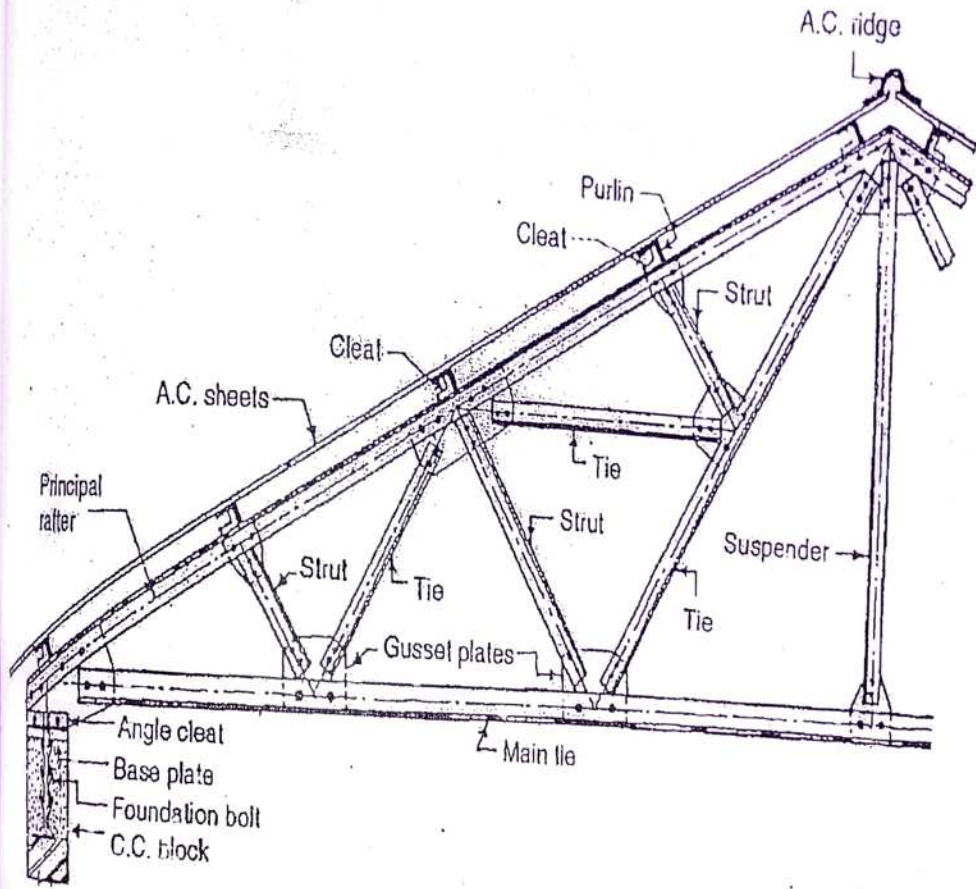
DETAILS OF STEEL ROOF TRUSS
